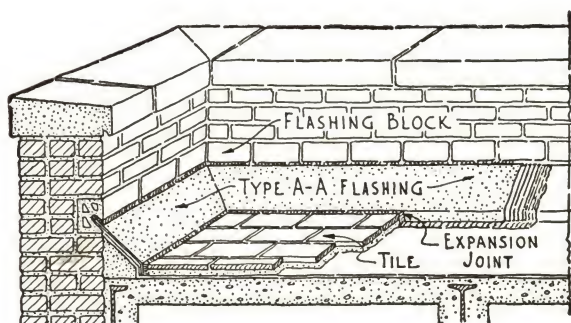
DETAILS FOR INSTALLING FLASHING IN CONNECTION WITH PROMENADE TILE ROOFS
